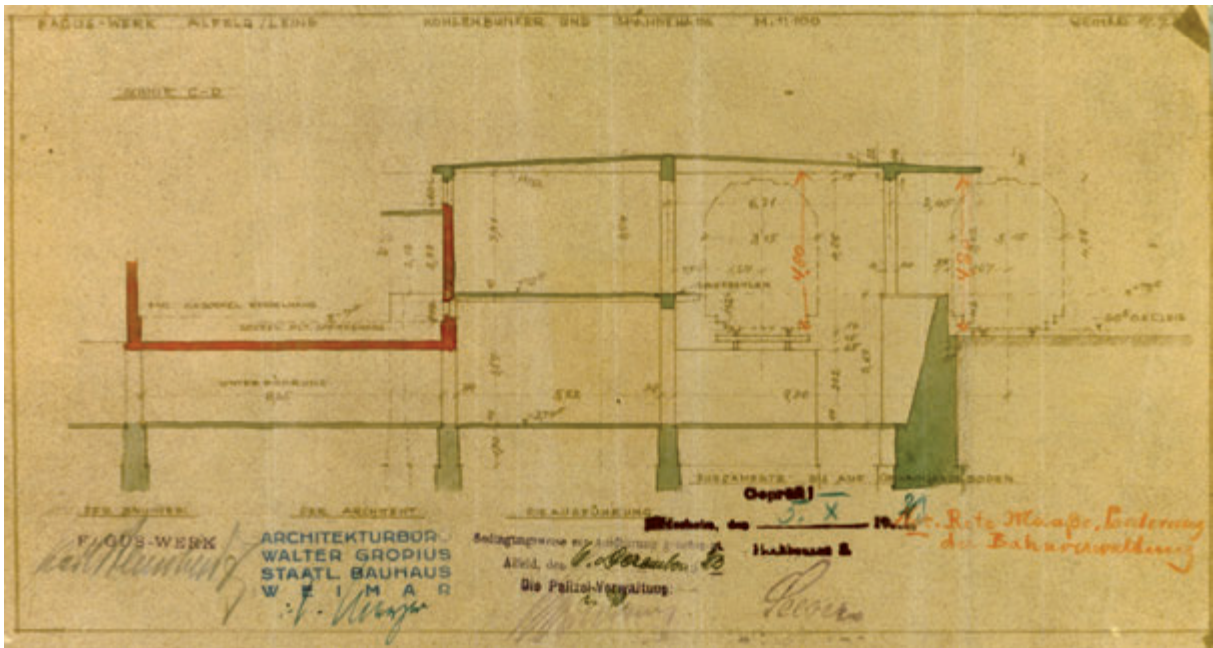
Sectional drawing of chip and coal bunker, Gropius/Meyer, 1921
